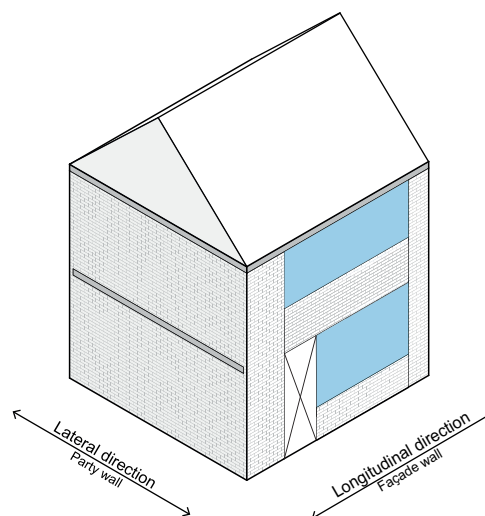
Typical terraced house with large windows in façade wall resulting in a low capacity in the longitudinal direction.
